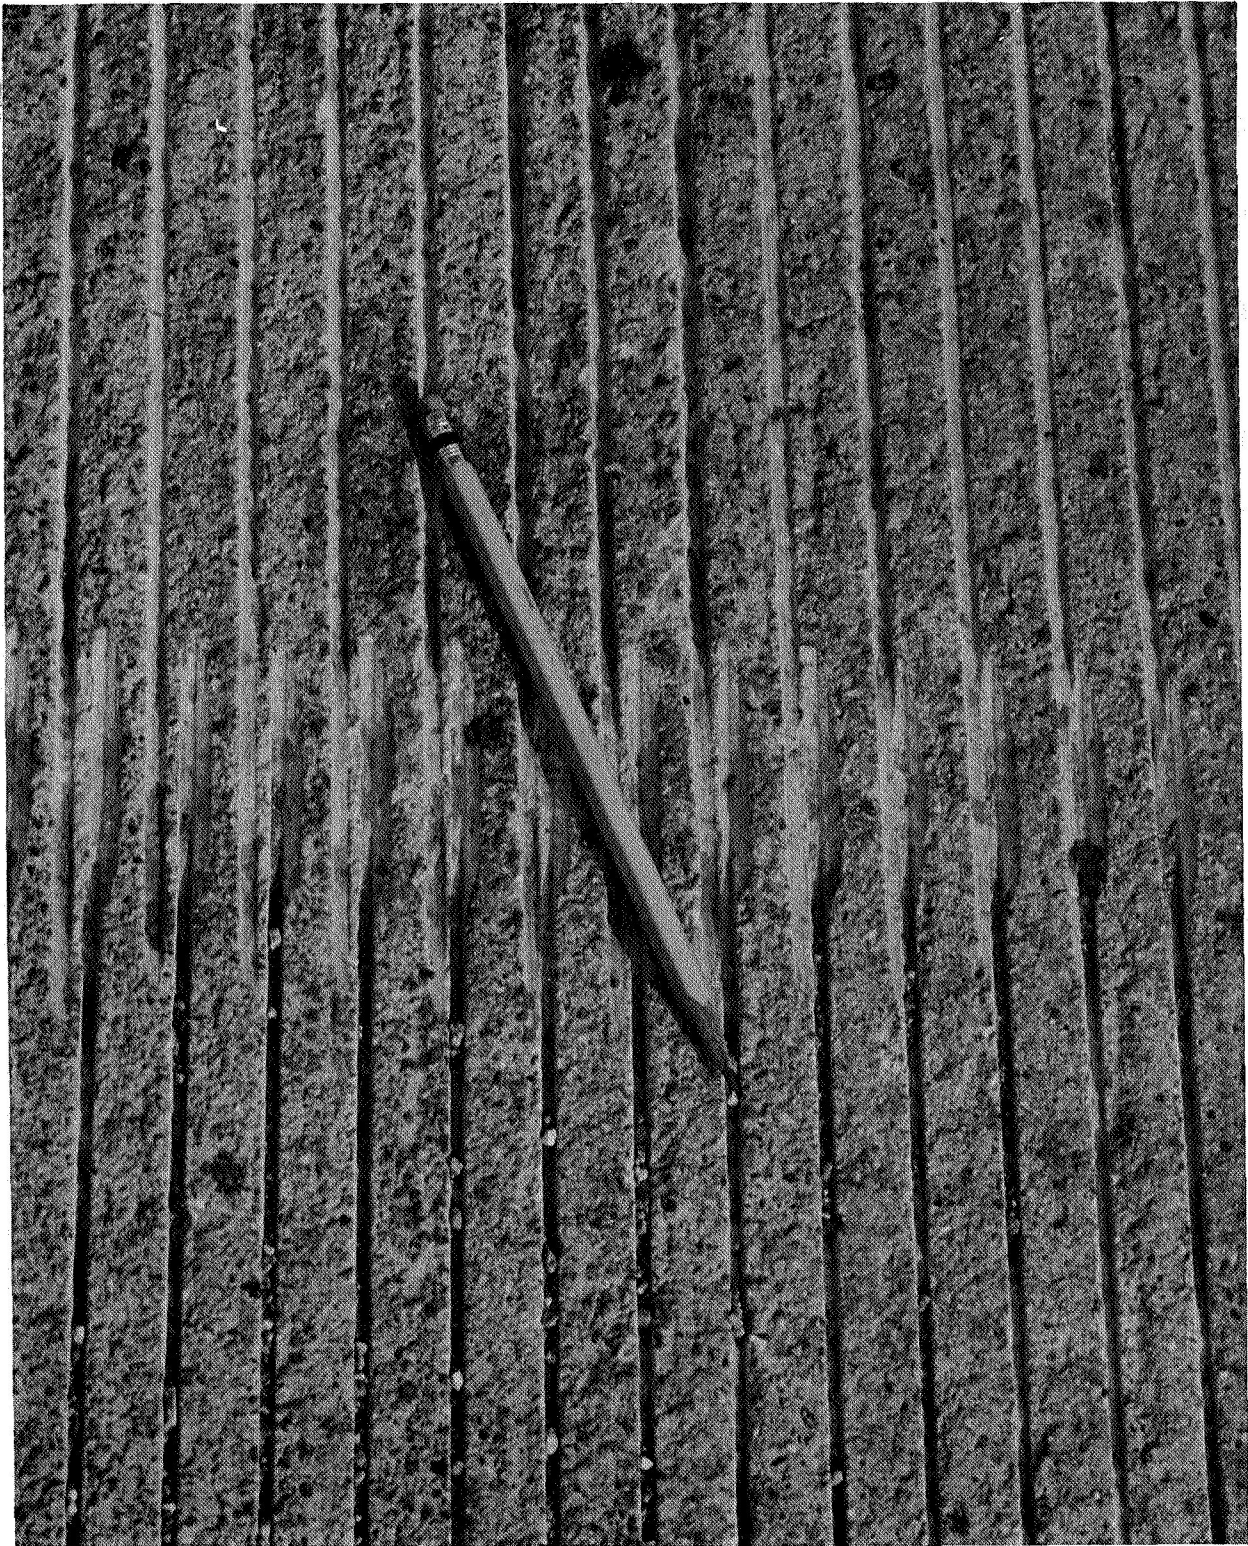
Pavement with 1/8-inch-wide grooves at top and 0.095-inch-wide grooves at bottom.
